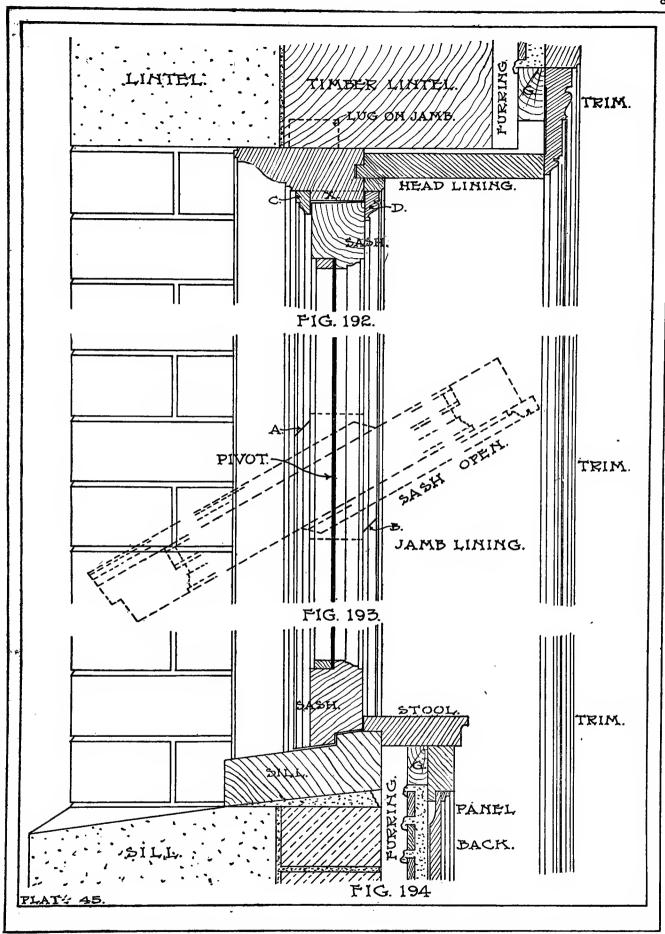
HORIZONTALLY PIVOTED CASEMENT WINDOW
